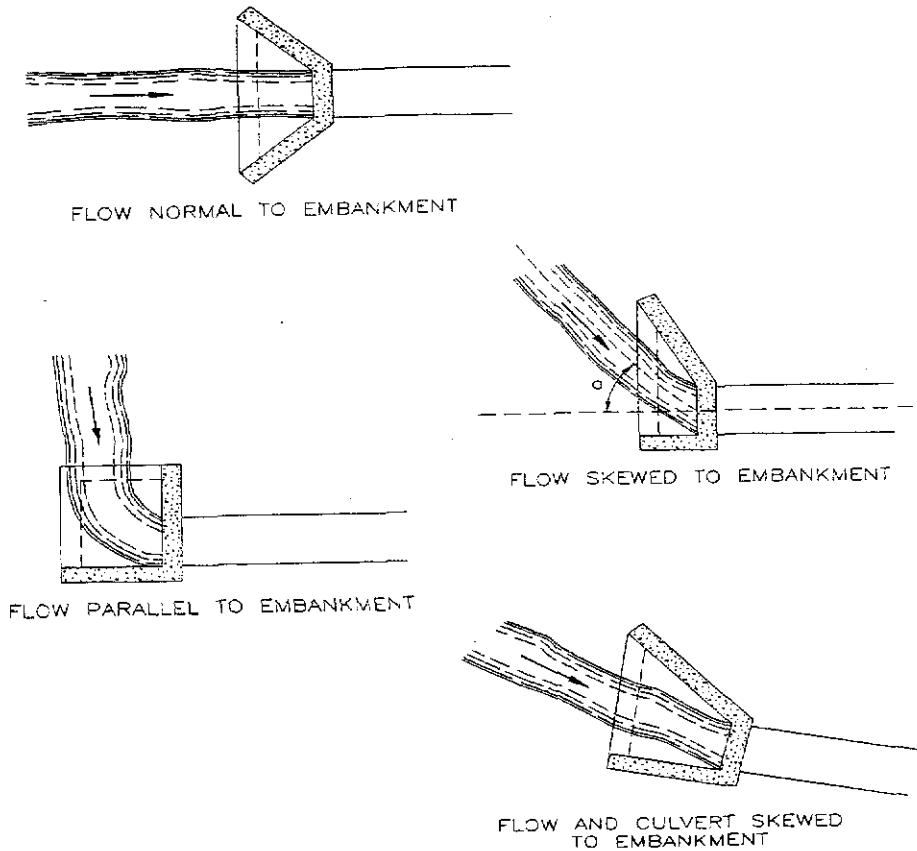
Typical Headwall/Wingwall Configurations for Skewed Channels
